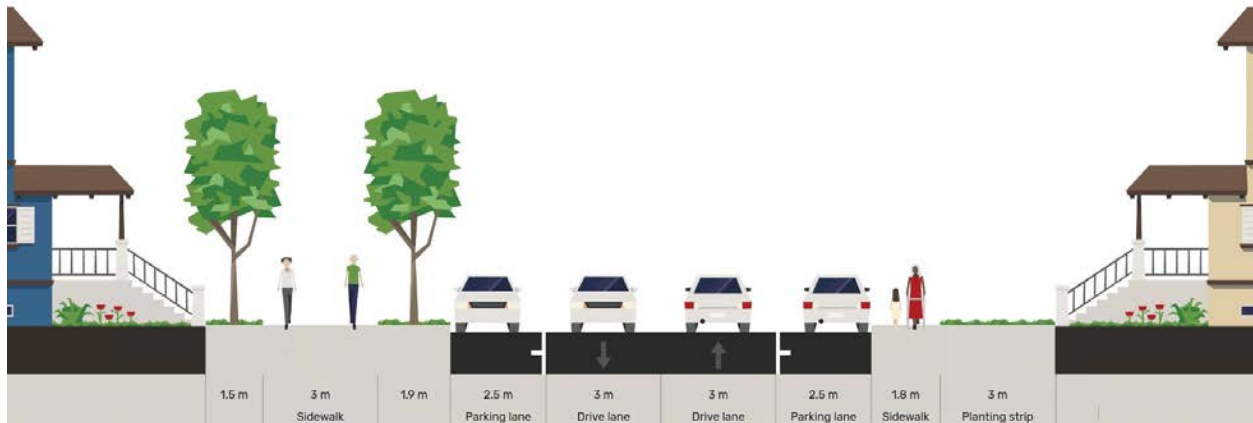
Potential Alma St Cross Section (North of West Fourth Ave) with Building Line
